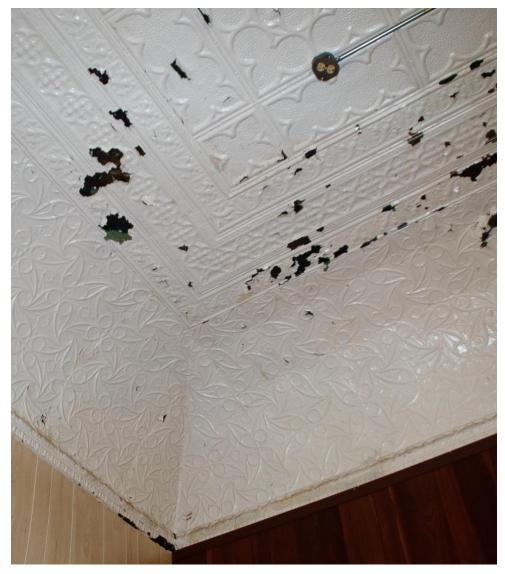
Main Interior Area, Stamped Tin Cove/Ceiling Detail
